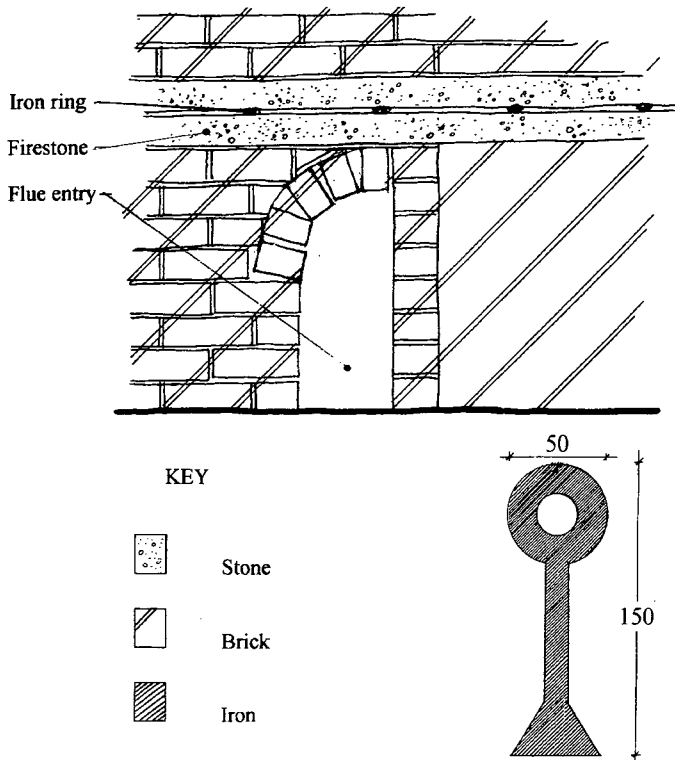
Elevation of front of flue, 1:20, and detail of iron ring, 1:4.
